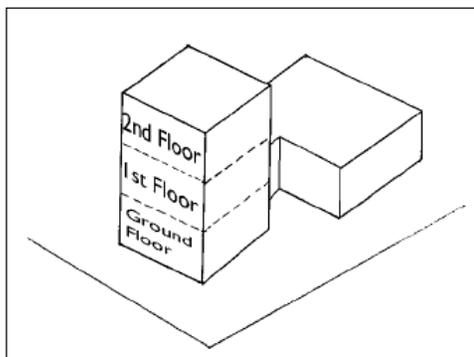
Schematic 3-D view of building for calculating total sign face area
